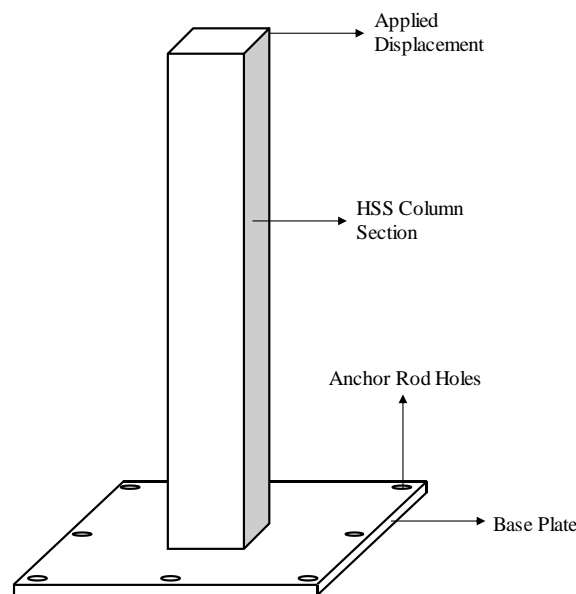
Base connection for HSS Column (8 anchor rods layout)
